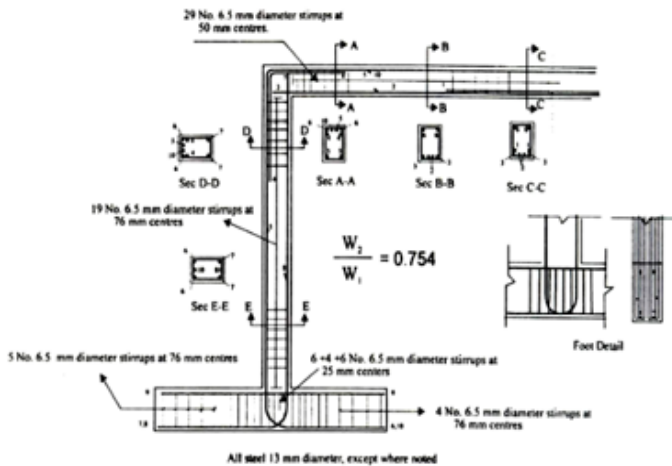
Reinforcement details of test frame [Cranston and Cracknell \(1969\)](#)
